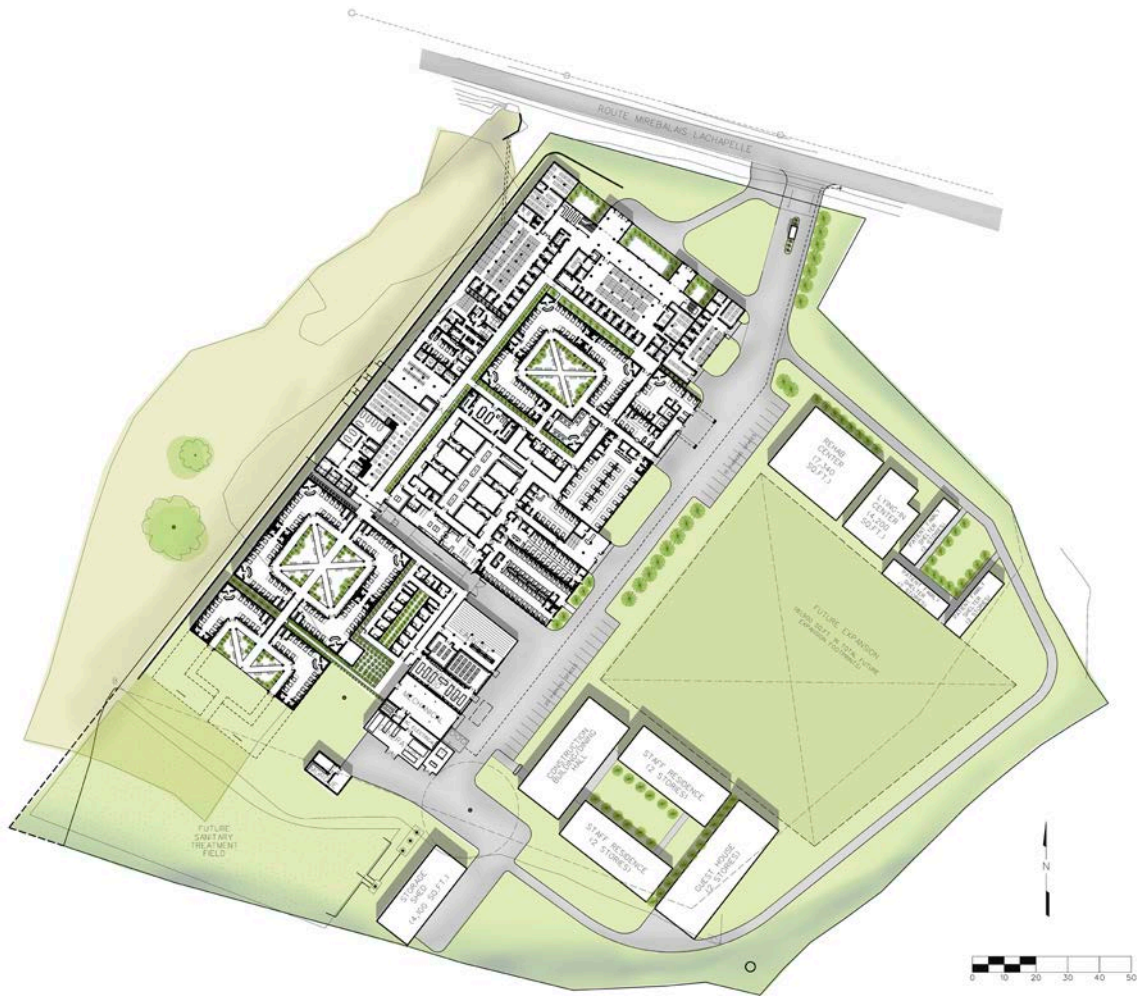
Site plan. Source: Ann Clark Architects LLC/Nicholas Clark Architects Ltd.
